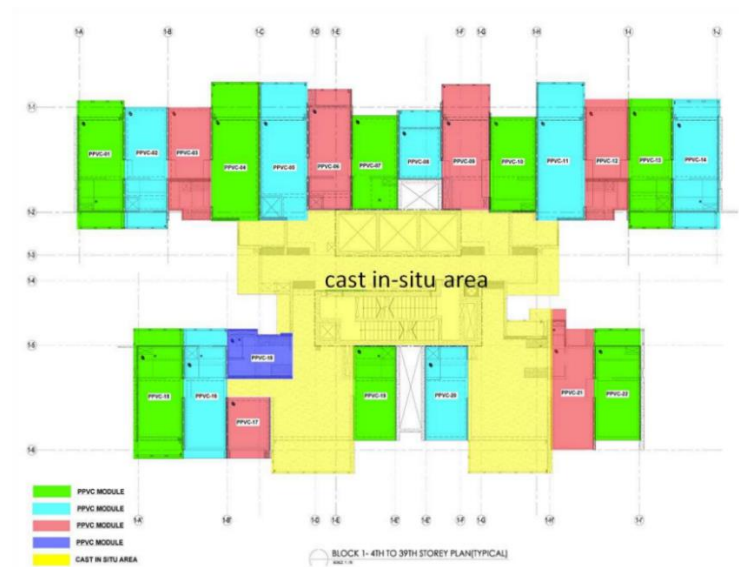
Floor plan for one of the towers (Seng et al., 2021)
